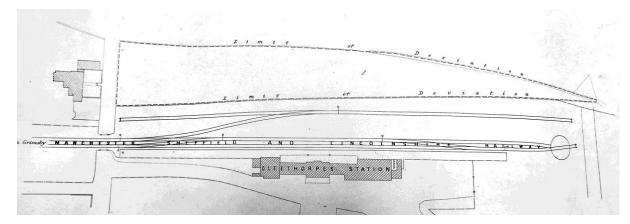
Cleethorpes station plan – LDP/1/120 further Powers 1873
